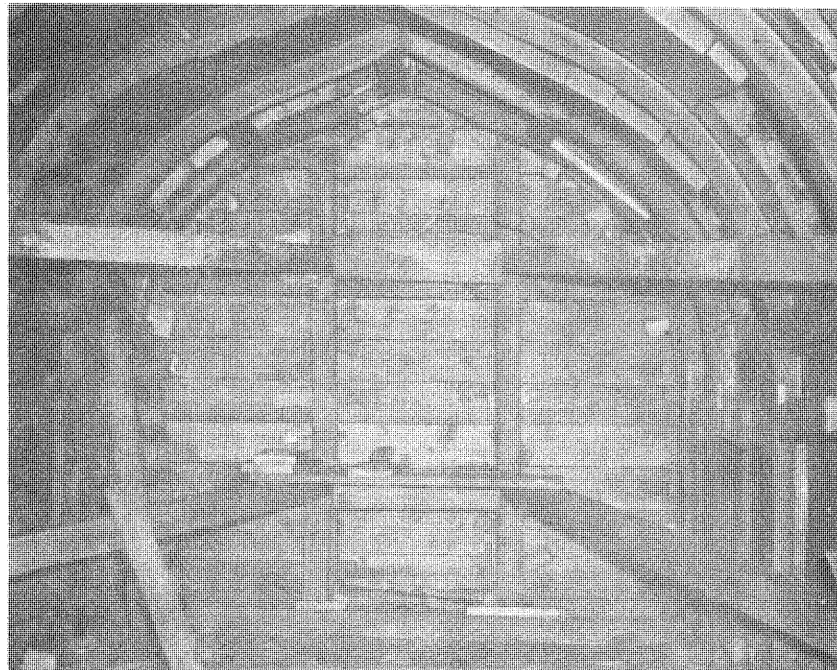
Bulkhead installed at end of tunnel excavation, station 19+06. Material on opposite side of bulkhead was excavated by dredging. P783-908-770, April 19, 1952.
